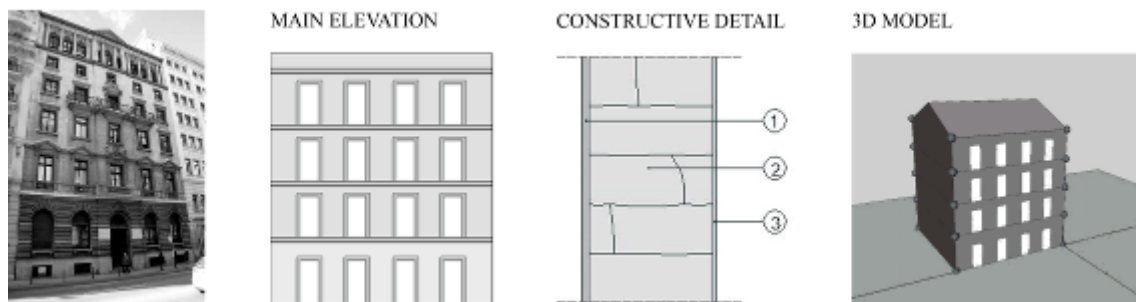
Barcelona.1931-32. Casal del Metge. Via Laietana, 31. Architects: Adolf Florensa & Enric Catá.
